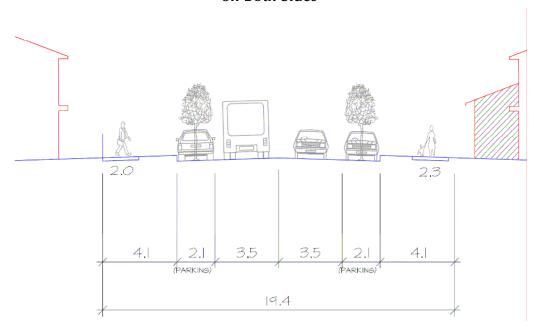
Neighbourhood Connector B – Typical Cross-section with Parking on Both Sides
